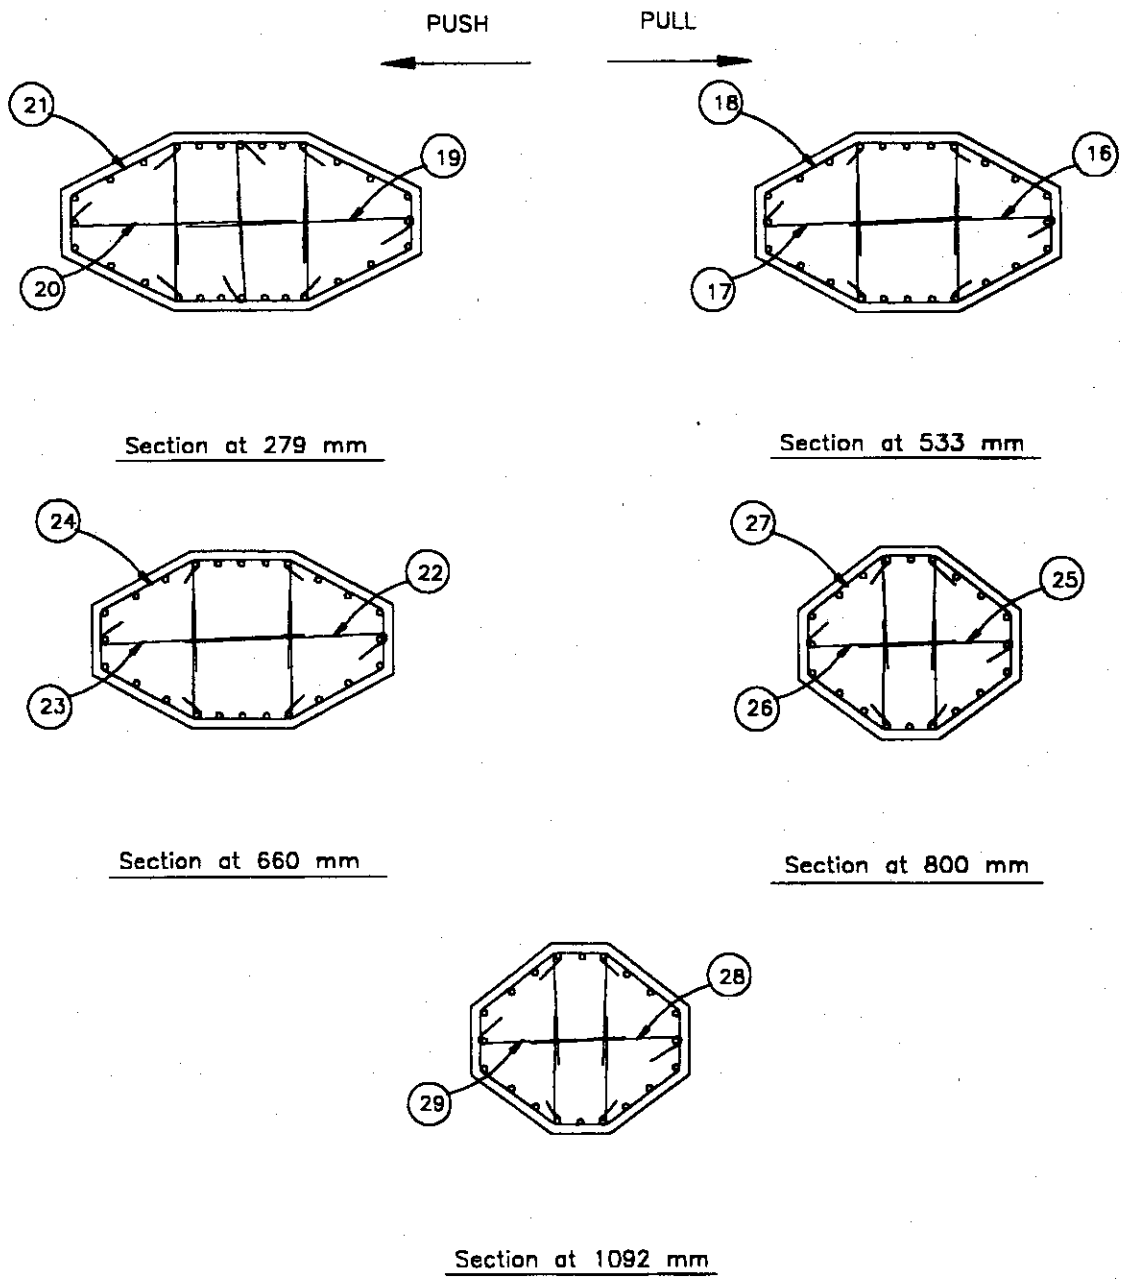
Strain Gages on Transverse Reinforcement of Specimen FA
